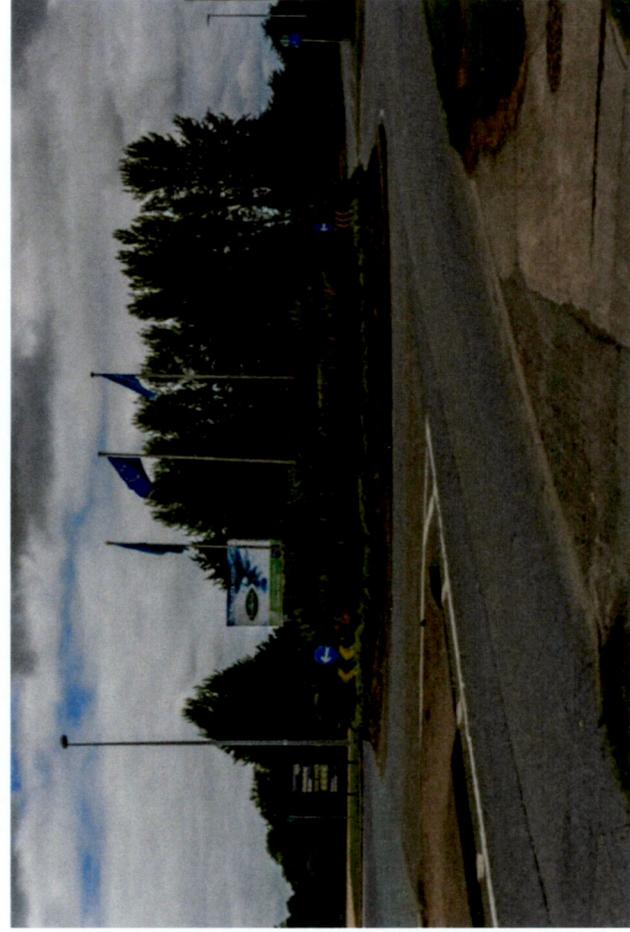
Existing View from the Roundabout and Falcon Avenue
